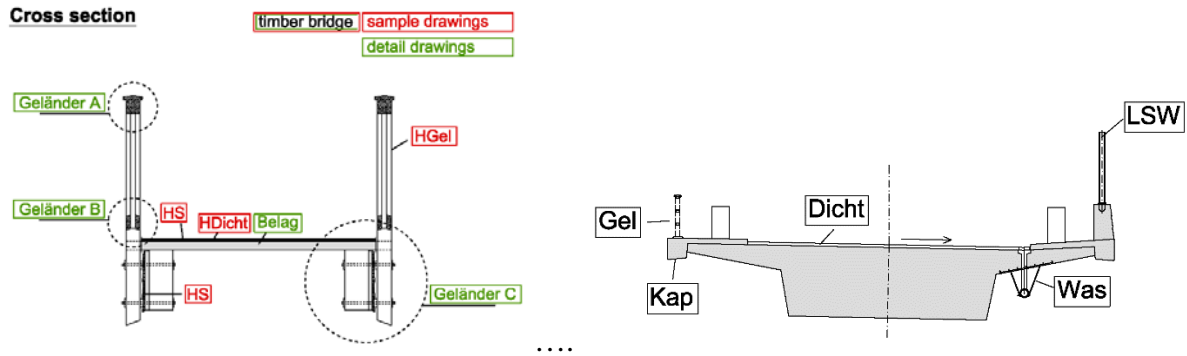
Cross section of a timber bridge (left side) with details in existing sample drawings (red) [7] and detail drawings (green) [6] and cross section of a concrete bridge with details in approved specification drawings (right side) [9]
